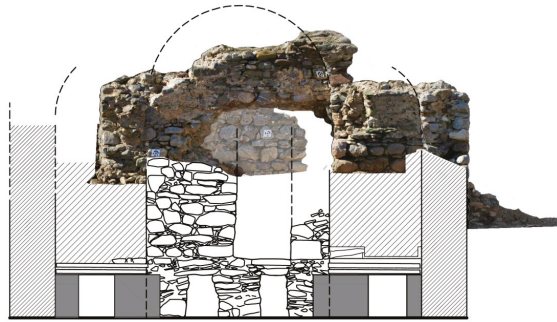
Elevation drawing of Building B, depicting the hypocaust and vault reconstruction. (Drawing: Th. Mangana).
